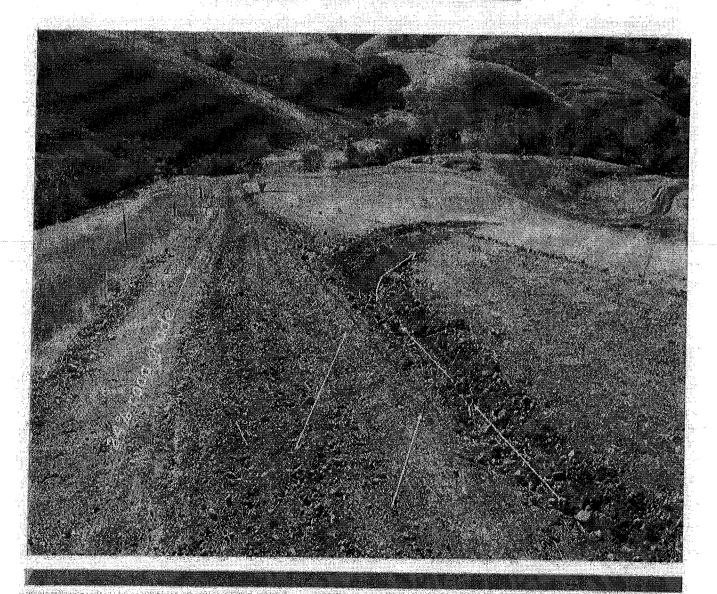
Steep roads that go straight up or down a hillaide are very difficult to drain. This steep, fall line road developed a knowledge of the cross section that was drained using lead out disches to direct runoff off the road and onto the adjacent, vegetated hillside. The road was "outsloped" to drain runoff to the right side, and the lead out disch was built slightly steeper than the road grade, to be self-cleaning. Four lead out disches have been constructed at 100-foot intervals to the bottom of the hillside.
